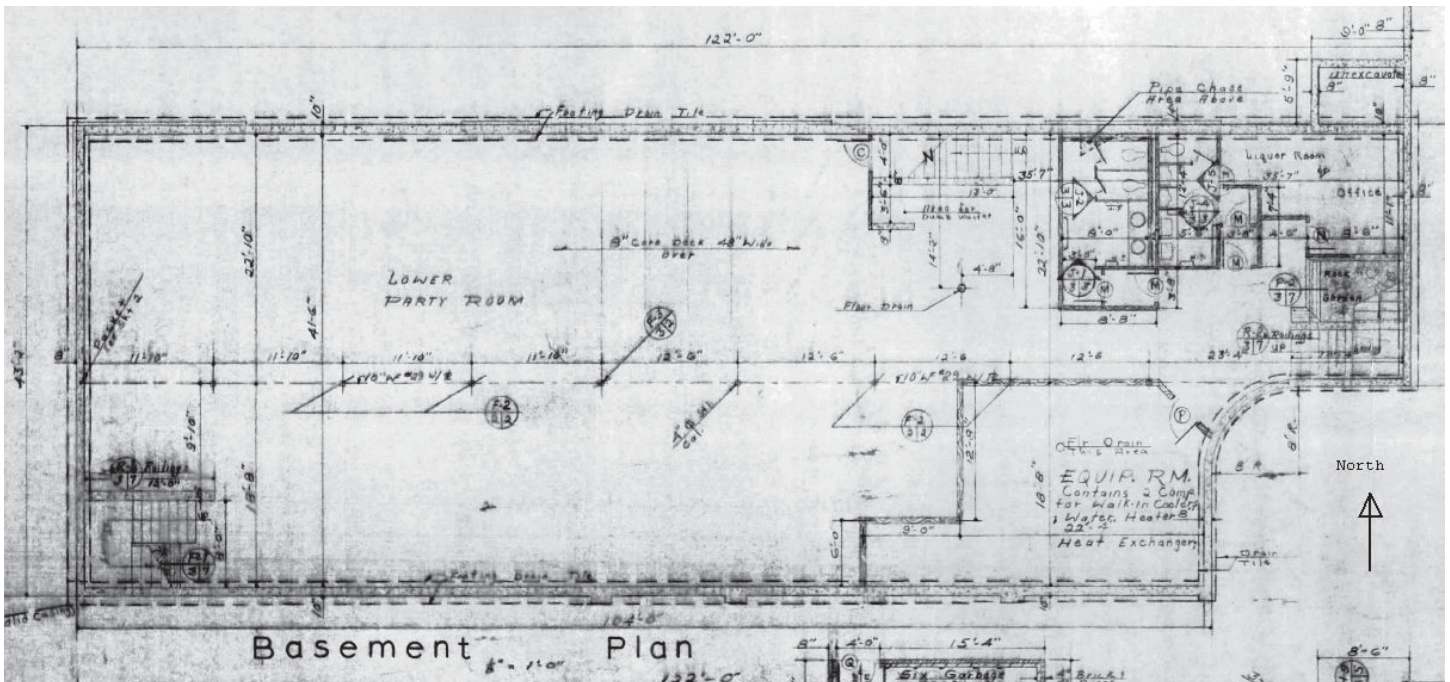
Original supper club basement plan, 1966 (Building plans)
